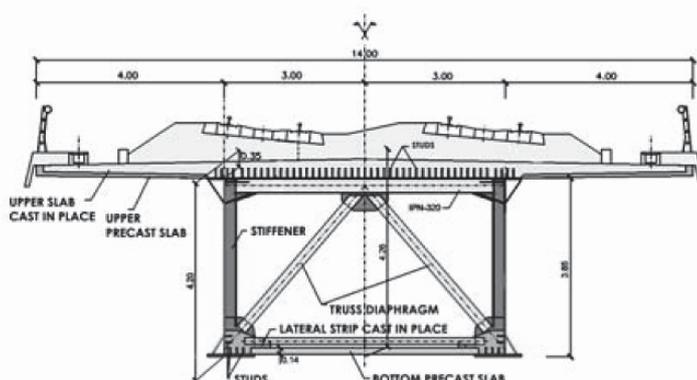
The viaduct of the Arroyo de las Piedras [61].
